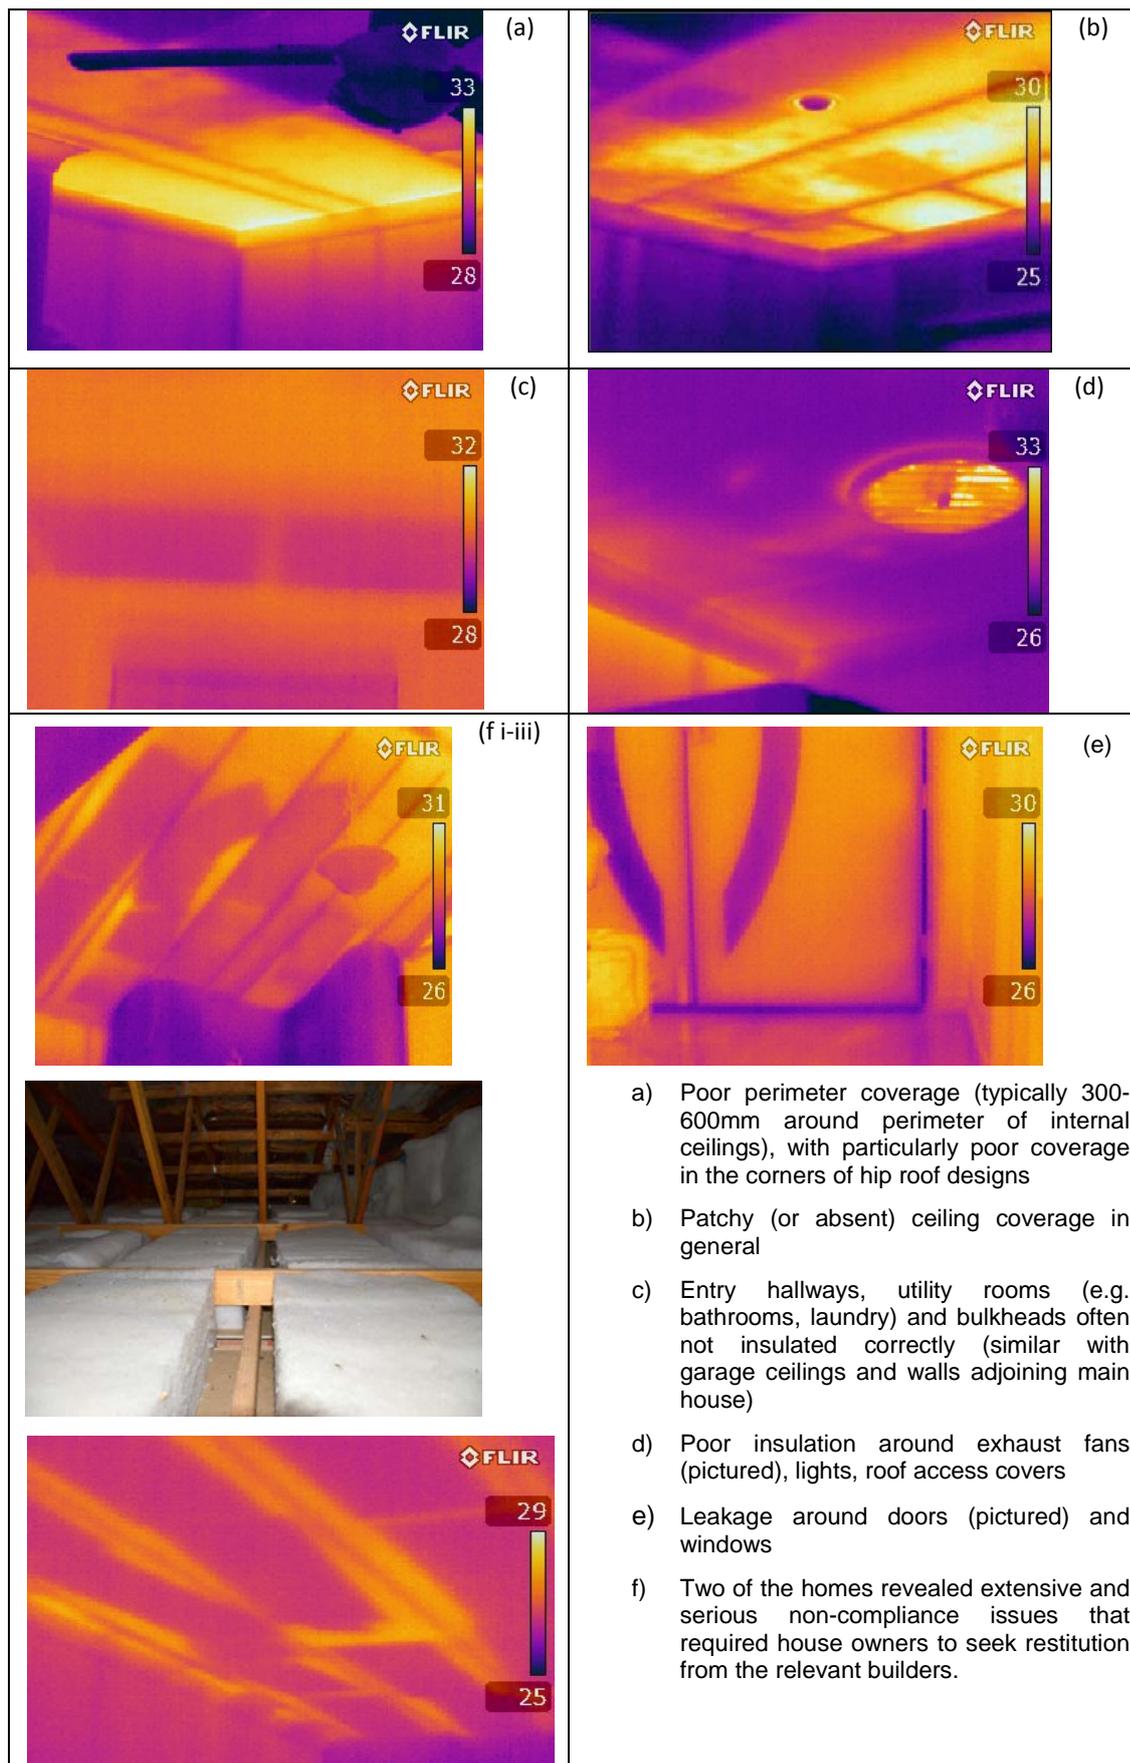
INSULATION INSTALLATION CHALLENGES IN TRADITIONAL CONSTRUCTION
